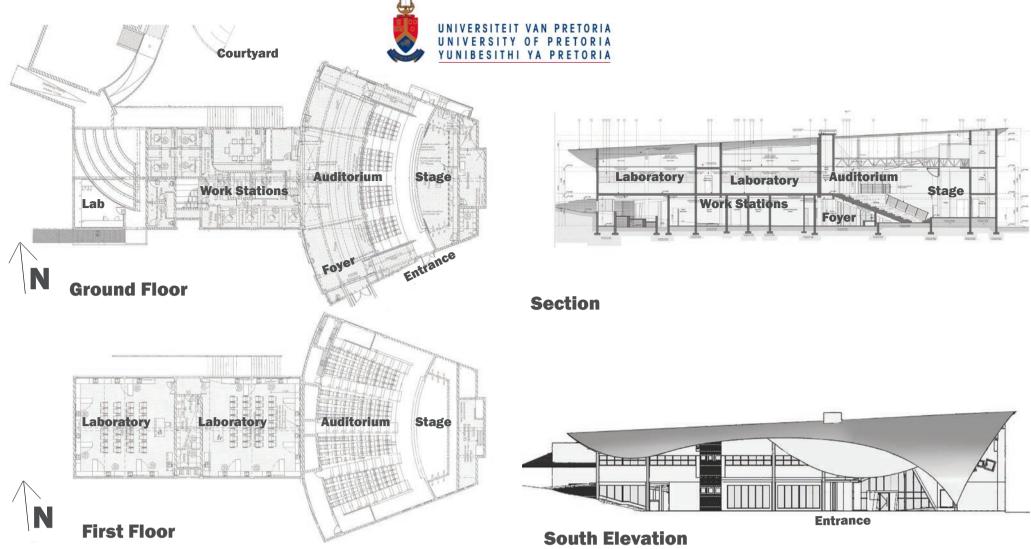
Architectural drawings of the science building (TJA, 2011)
